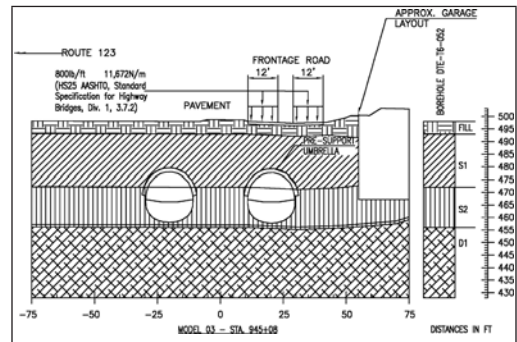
Arrangement of soft ground NATM tunnels near underground parking garage
